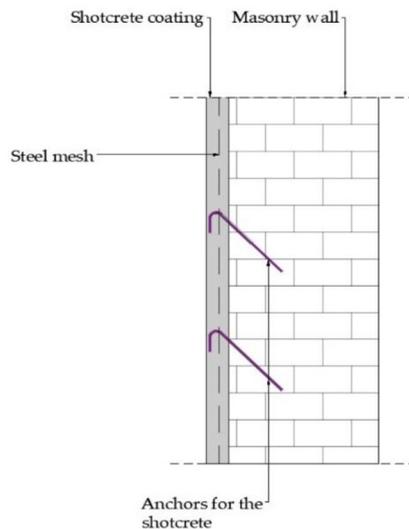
Detail for single-sided concrete jacketing with Anchors (based on [3]).
